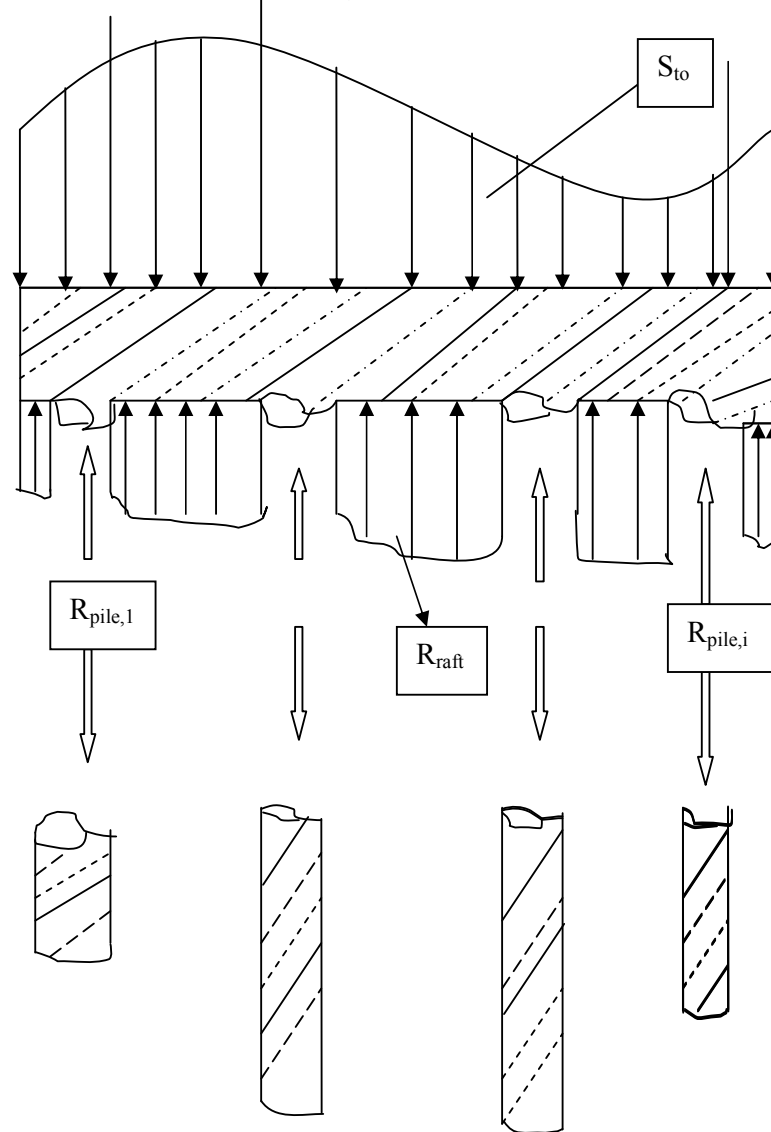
Piled Raft Foundation as a Composite Construction[00Hem]
